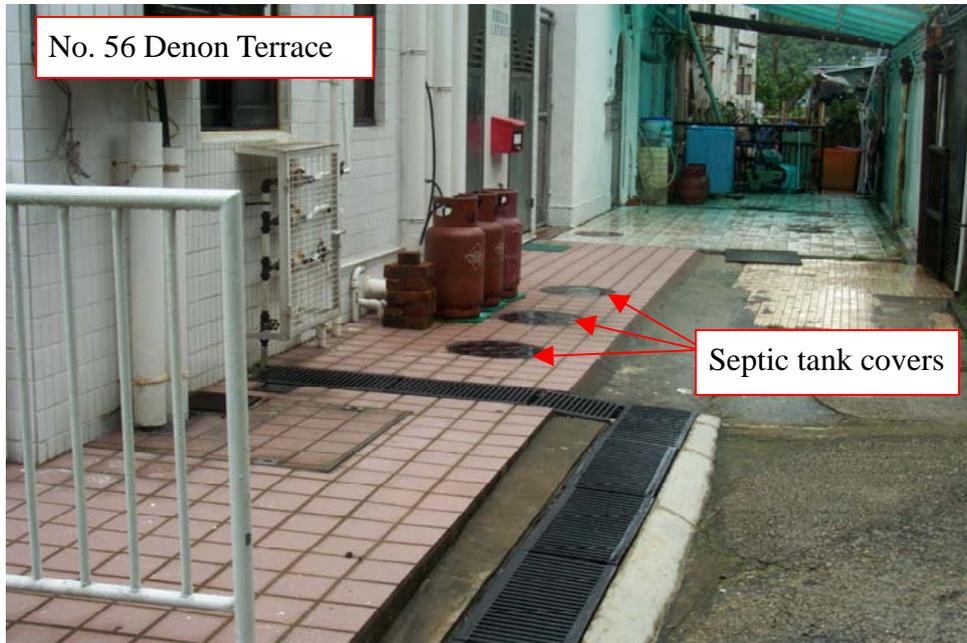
View of Septic Tank Location Adjacent to No. 56 Denon Terrace
